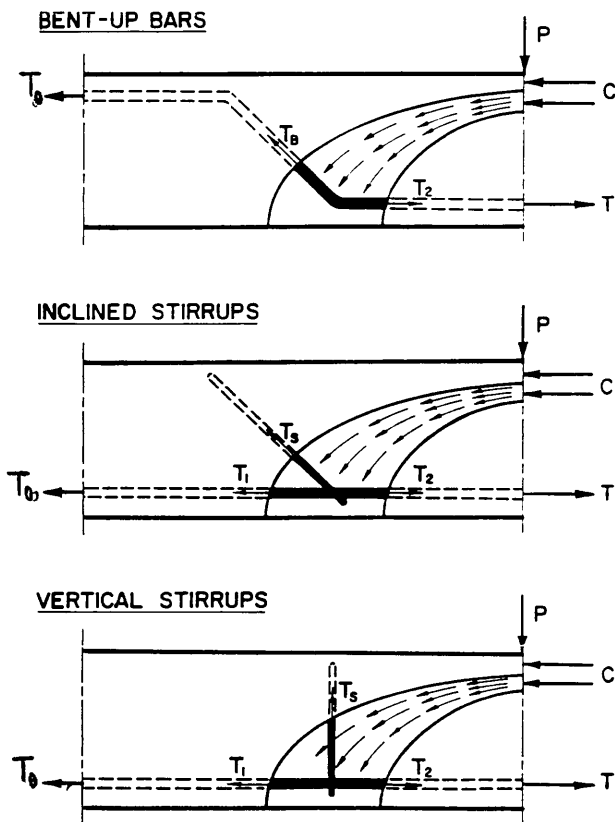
Arch supports provided by three conventional types of web reinforcement
